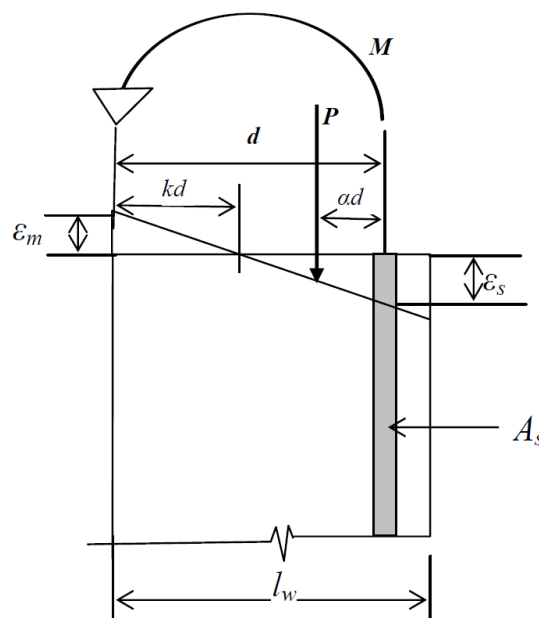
FLEXURE AND AXIAL WALL LOADING
